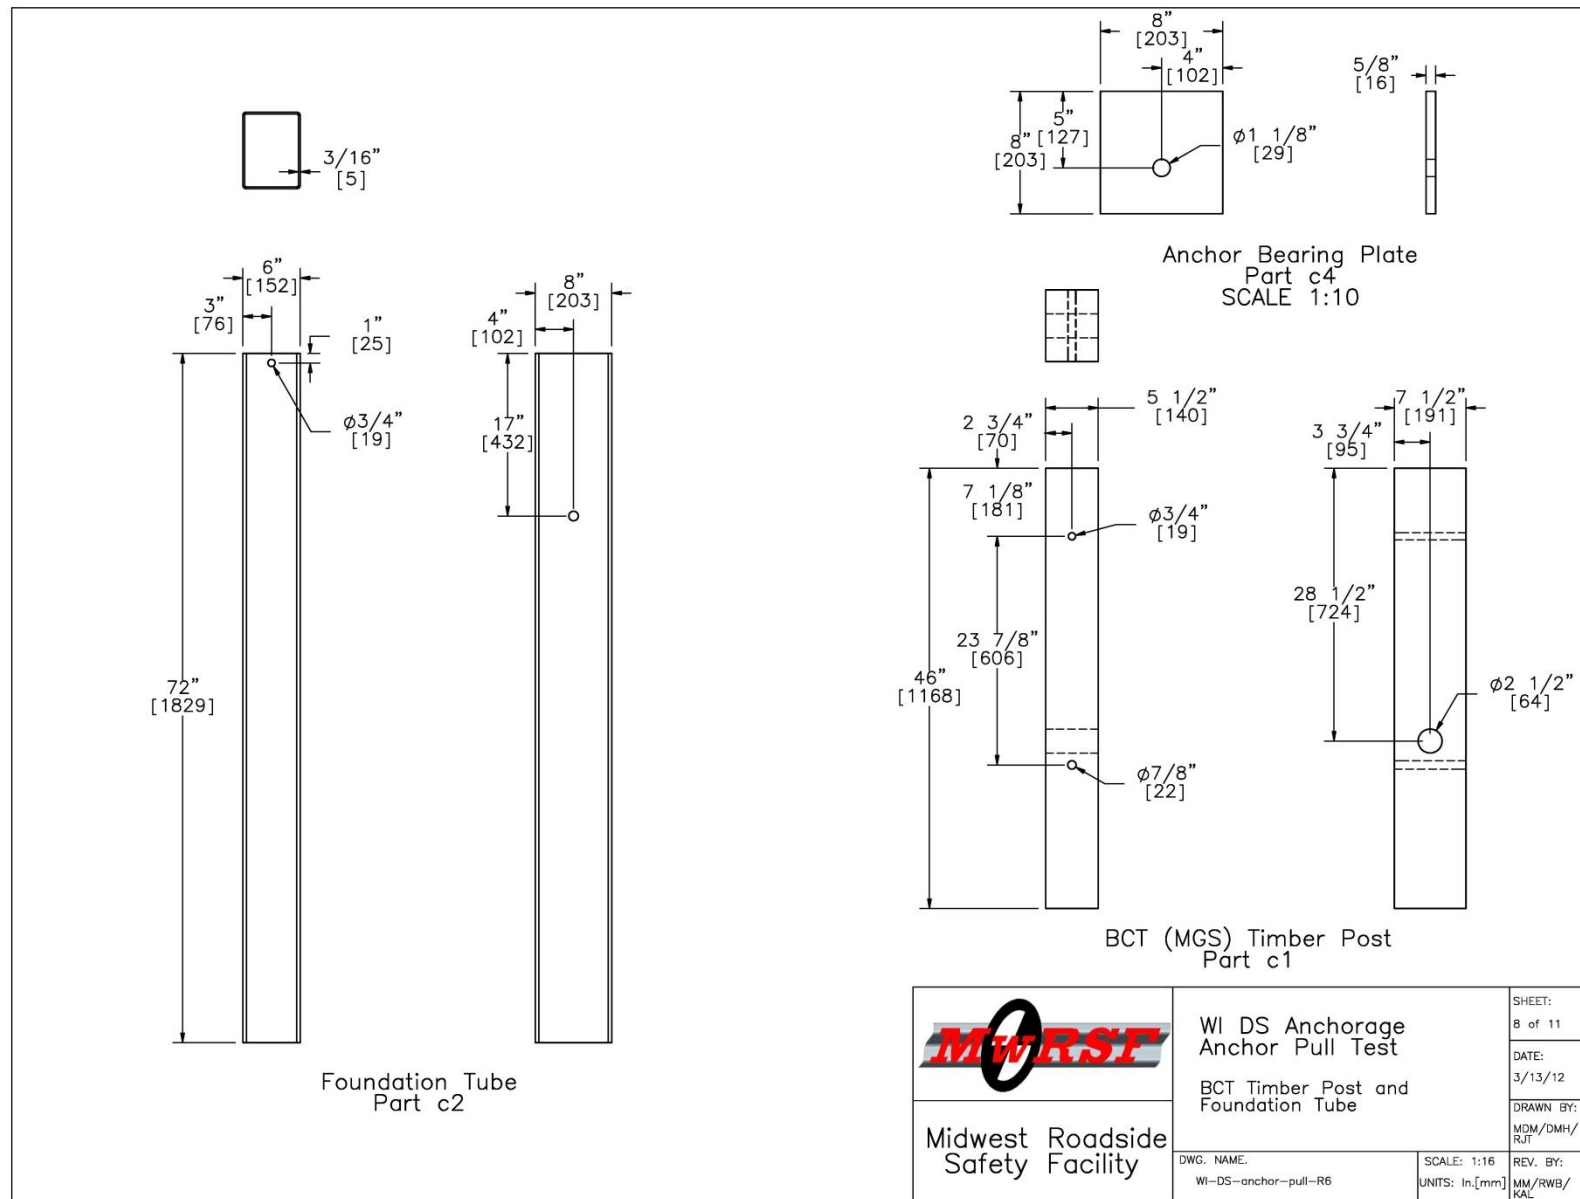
BCT Timber Post and Foundation Tube, Test Nos. DSAP-1 and DSAP-2
